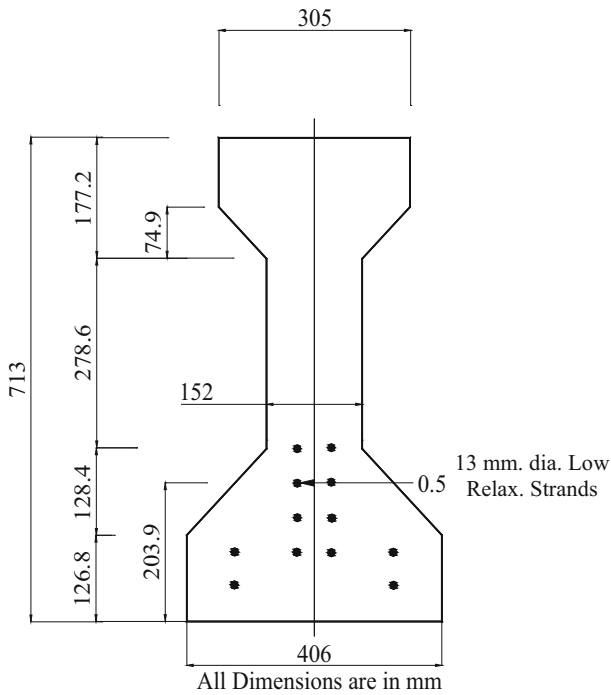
Cross section of PSFC I-Beam. Note 1" = 25.4 mm.
